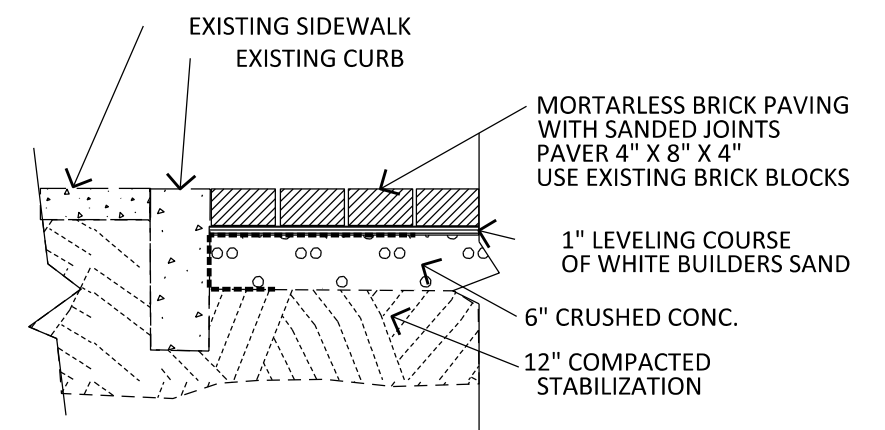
DETAIL- BRICKBLOCK PAVER APPLICATION AGAINST CURB-TREE WELL
